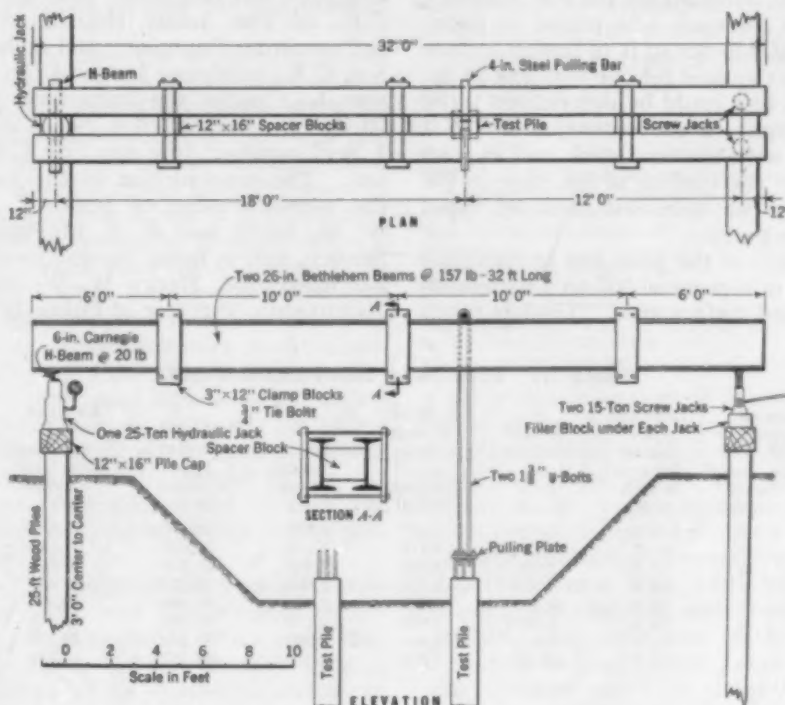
LAYOUT AND DETAILS OF PILE TESTING APPARATUS
